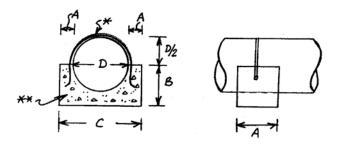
Counterweight Details for Pipes Subject to Uplift Forces
